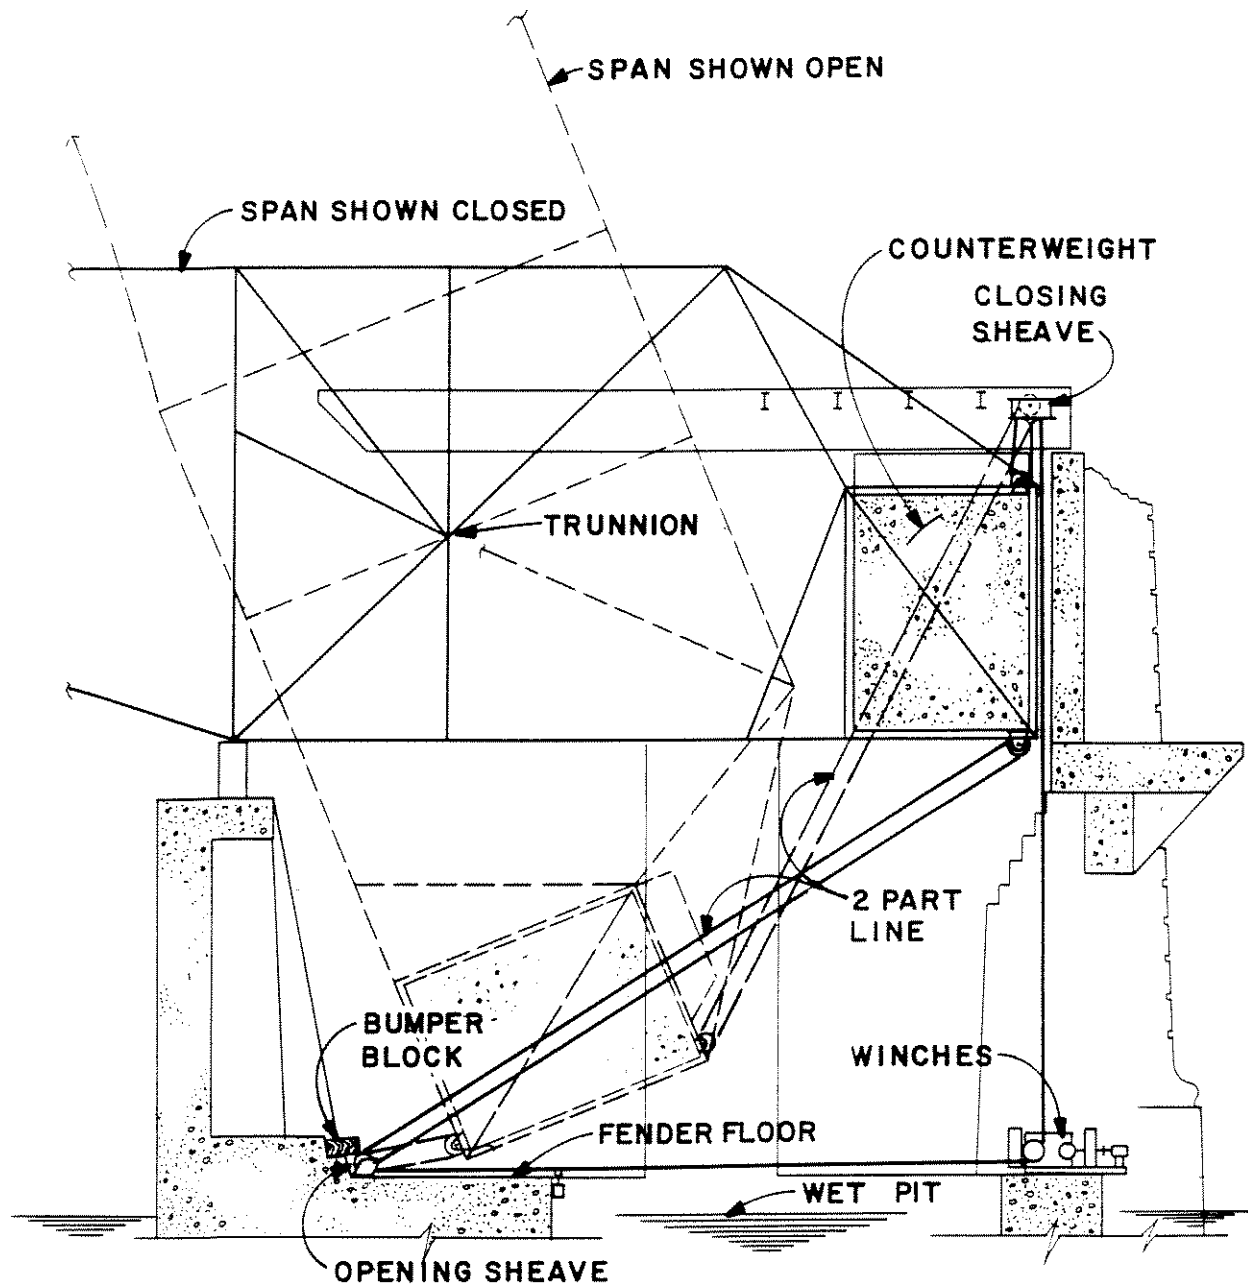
ELEVATION OF WINCH SYSTEM
